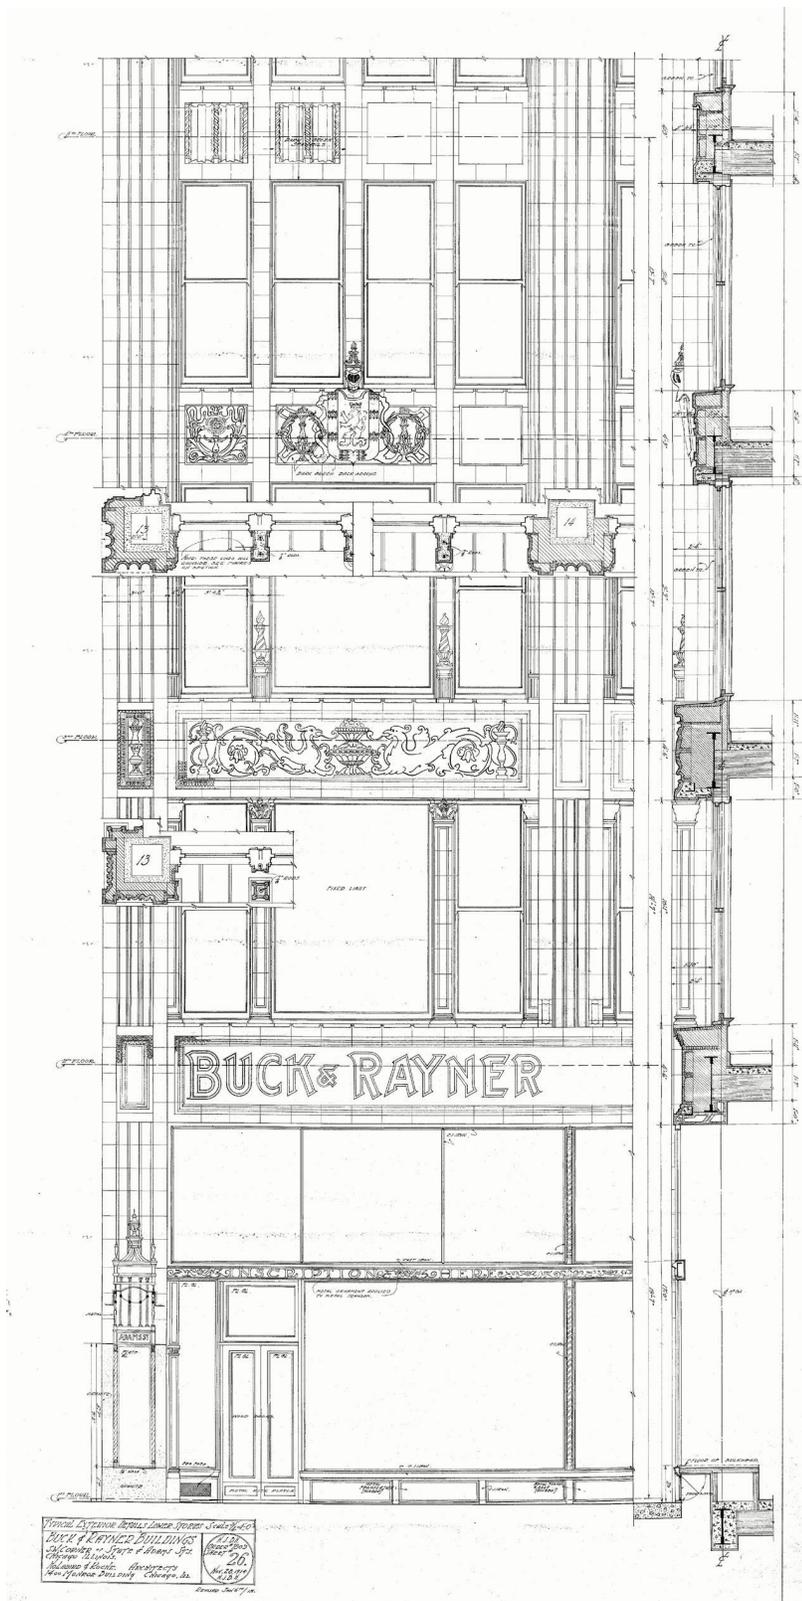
Original drawing, 202 S. State, north façade details, lower stories.
